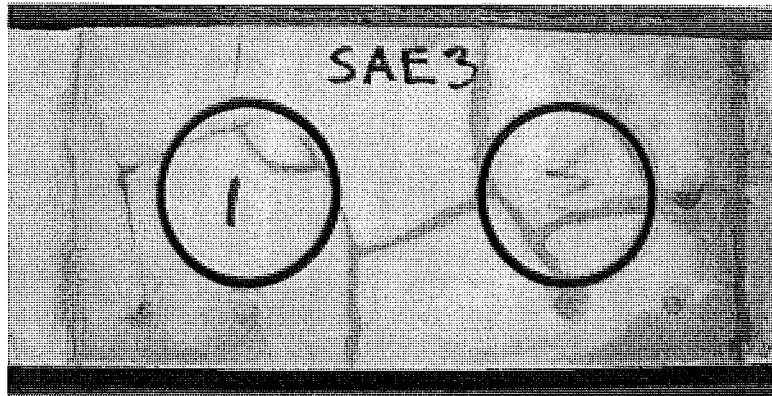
Typical pattern cracking observed on Brand Y specimens
